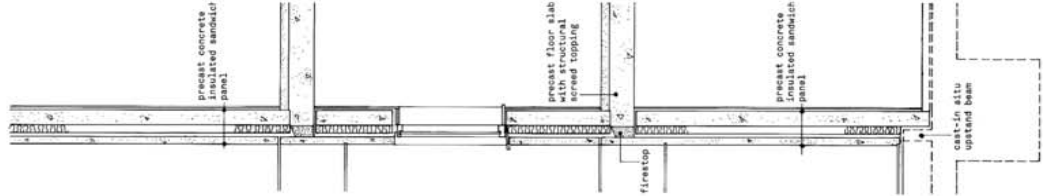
DETAIL OF PANEL-TO-FLOOR SLAB CONNECTION
